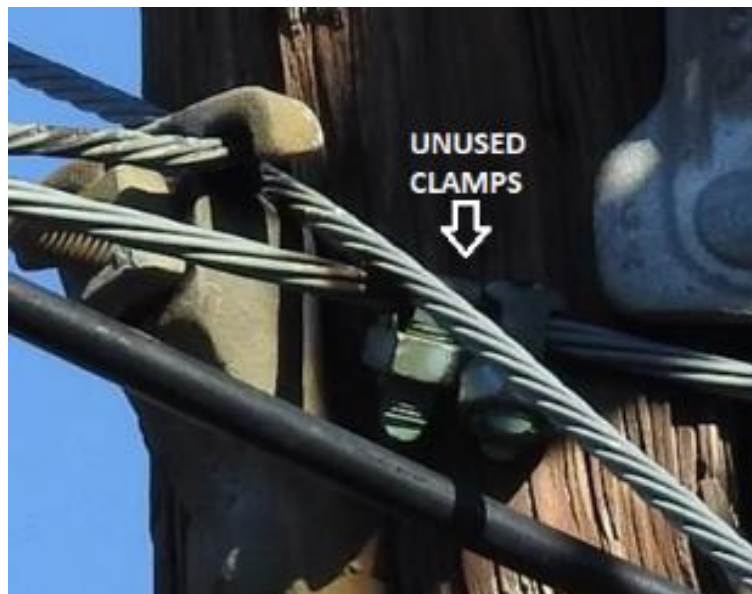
A detail of Messenger Wire 1 and Down Guy 2 showing the unused bonding clamps.³²
